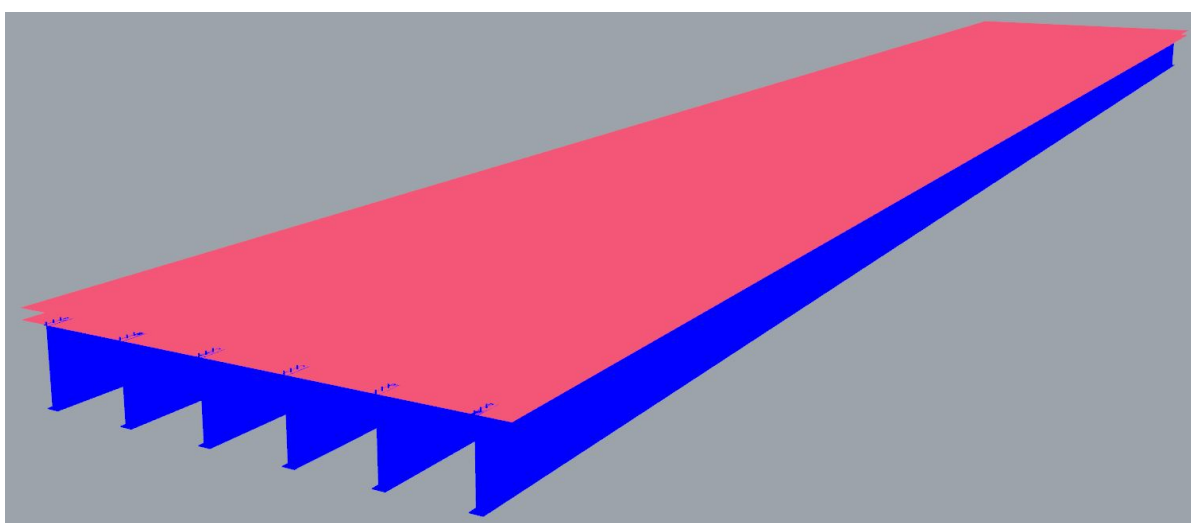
Multi-girder bridge as modelled with Karamba in Grasshopper. In blue the girders, in red the concrete deck
